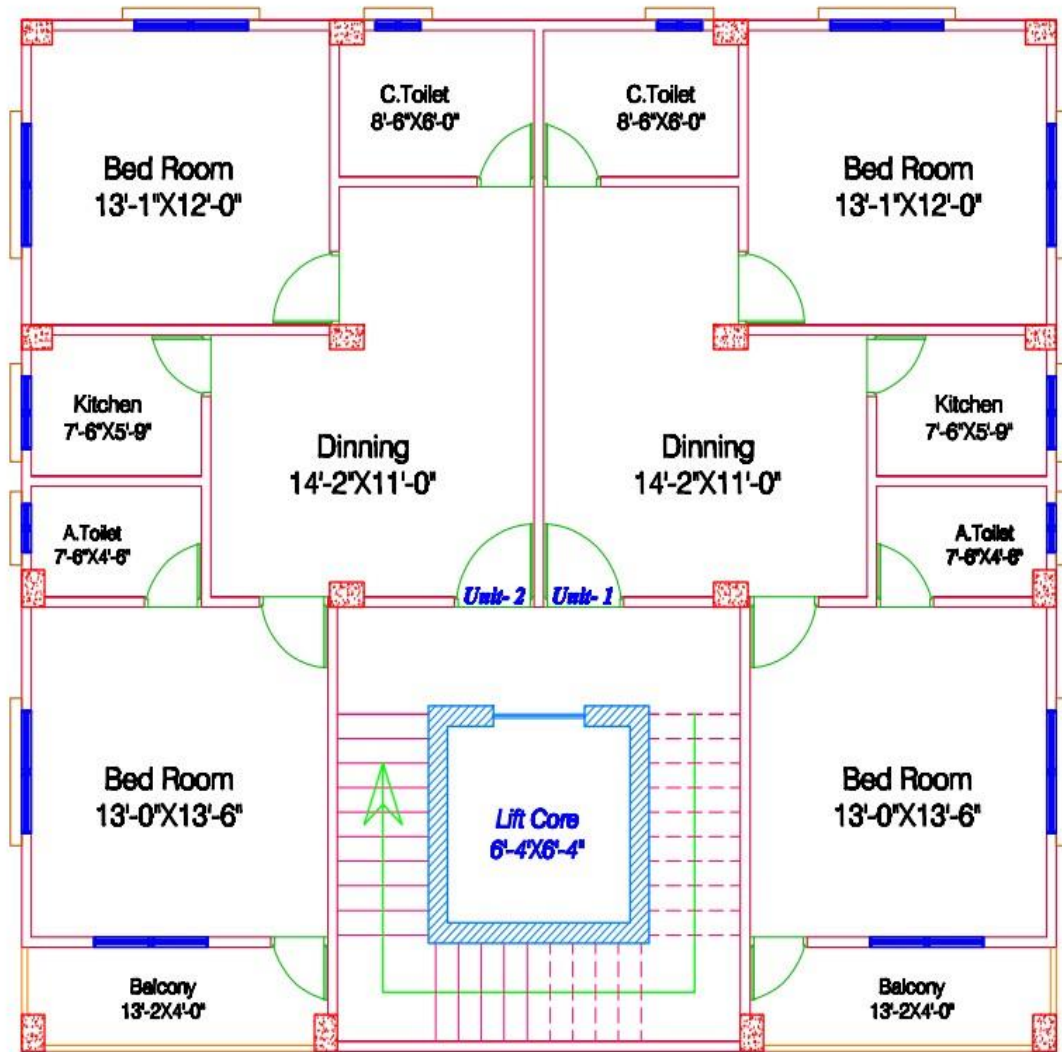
4(a): Architectural Plan for both option (Typical Floor Plan)
